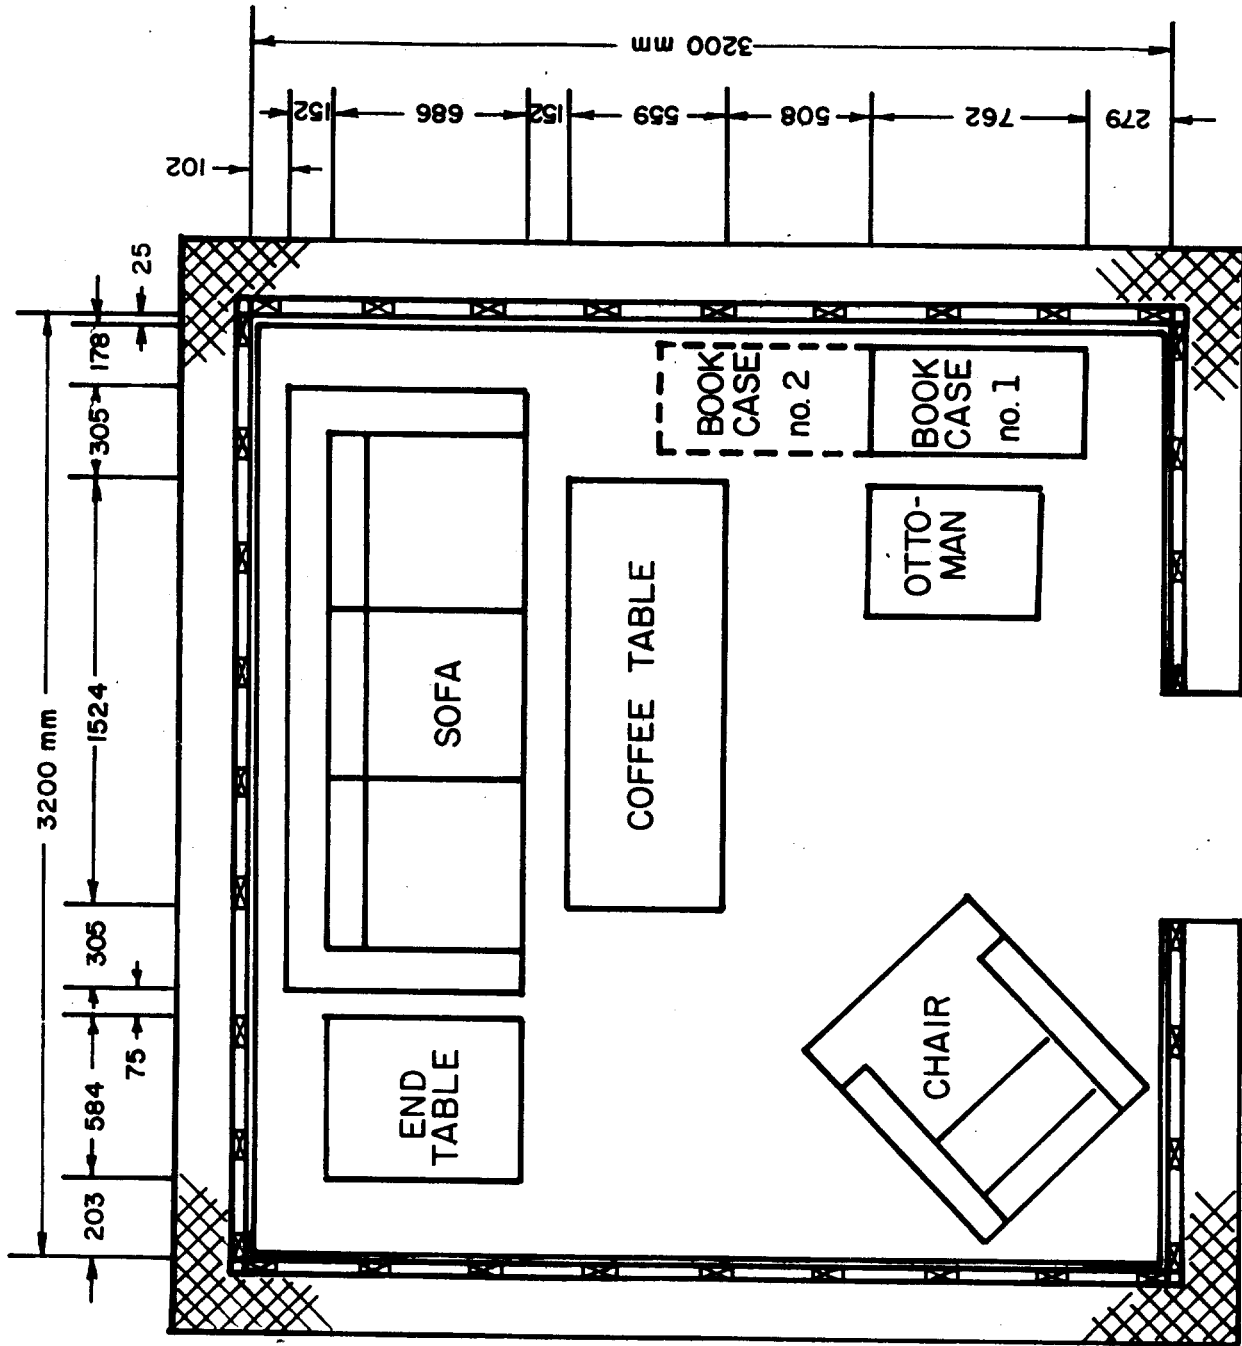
Layout of furniture and wall linings for the 3.3 x 3.3 m test room
